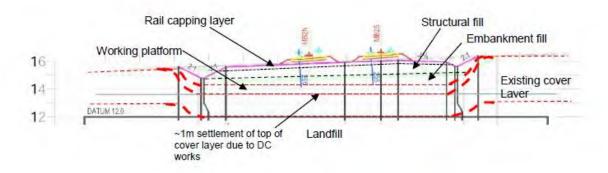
Rail embankment and subsurface layers at Ch 40,680
